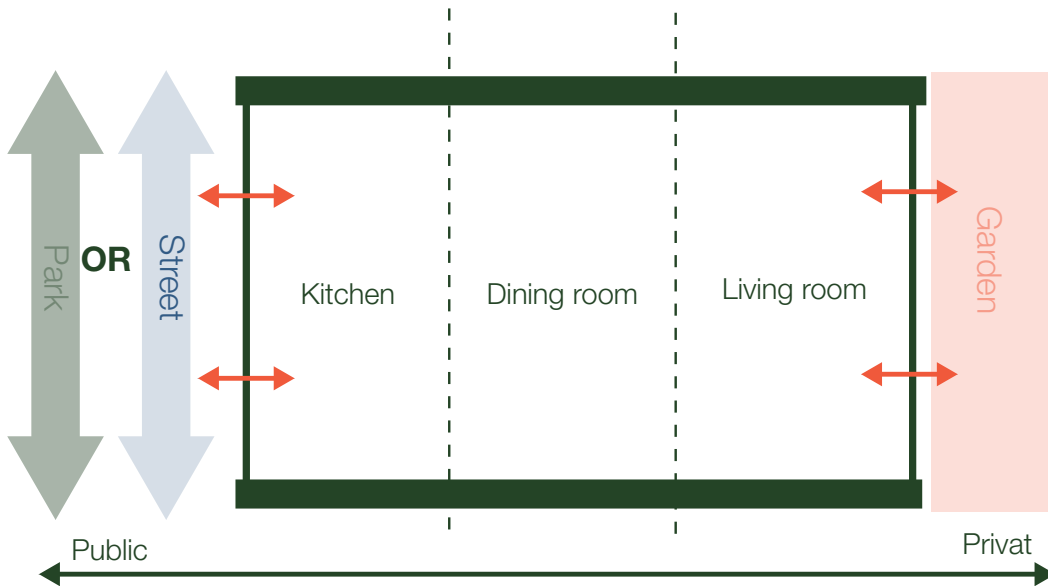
Schematic Floorplan of Groundfloor Layout in Relationi to the Landscapes, Source: (Own Work)
